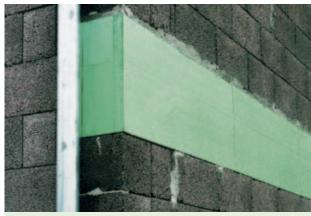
Insulation with Styrodur® 2800 C at the ceiling edge.
